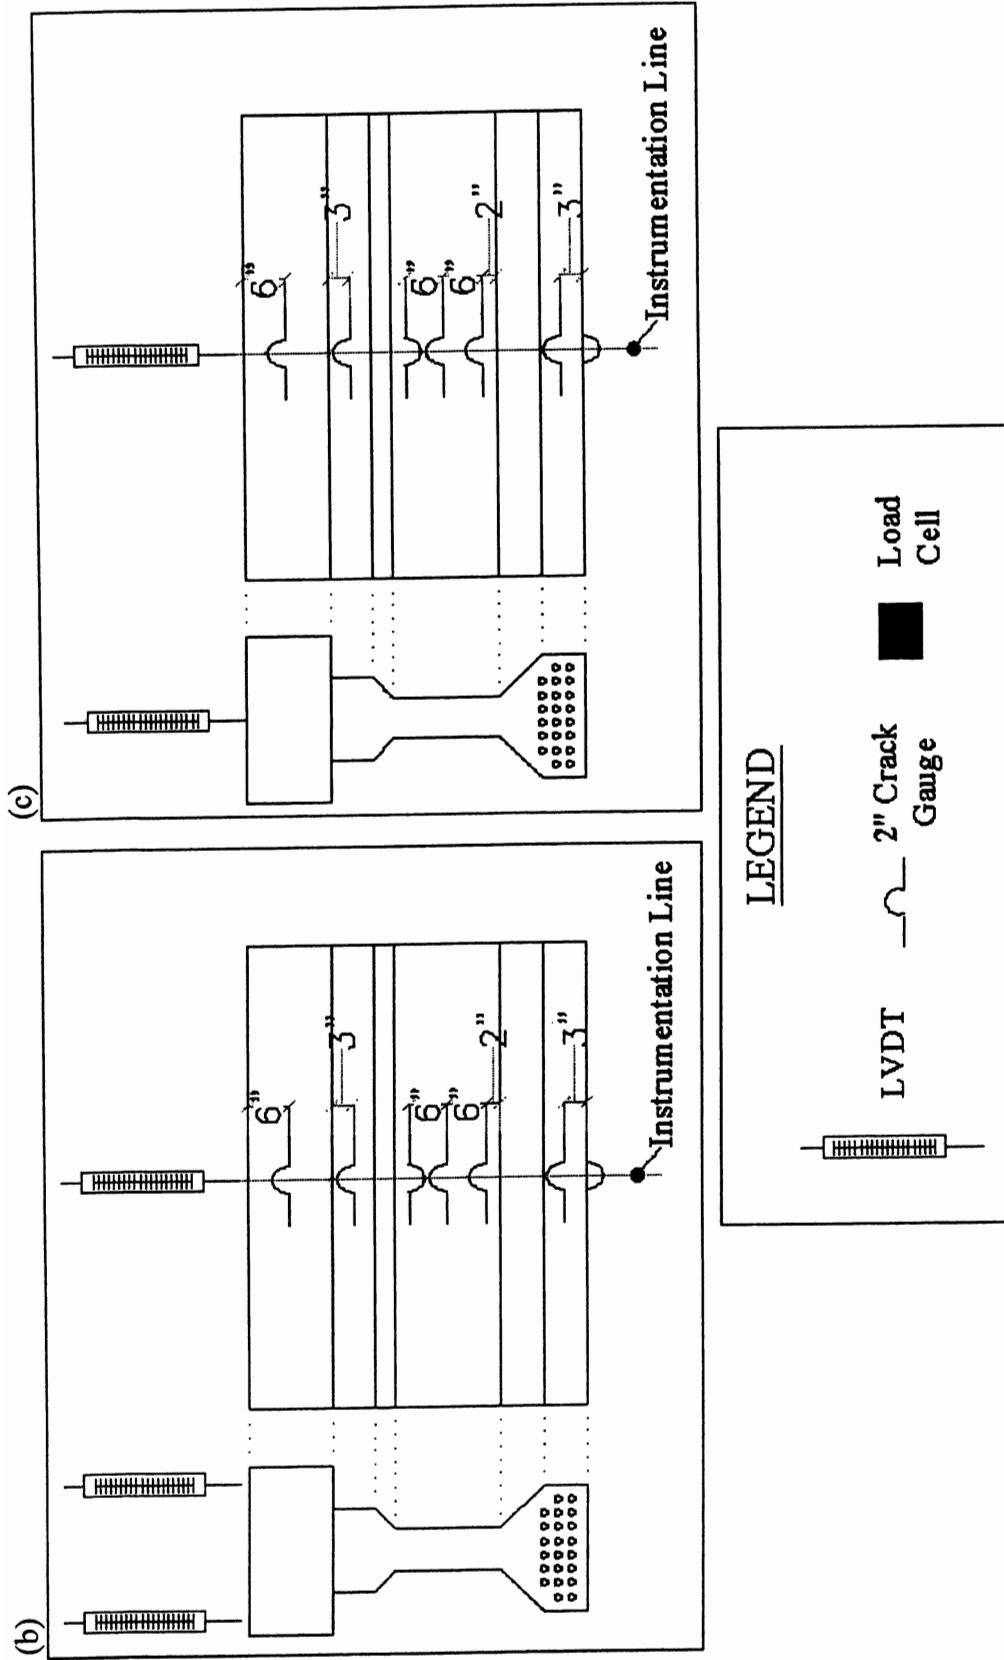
(continued): Typical Instrumentation for Four-Point Bending Tests b) Typical Instrumentation Locations for Section A-A Cross-Section in Figure 3-6a; c) Typical Instrumentation Locations for Section B-B Cross-Section in Figure 3-6a
